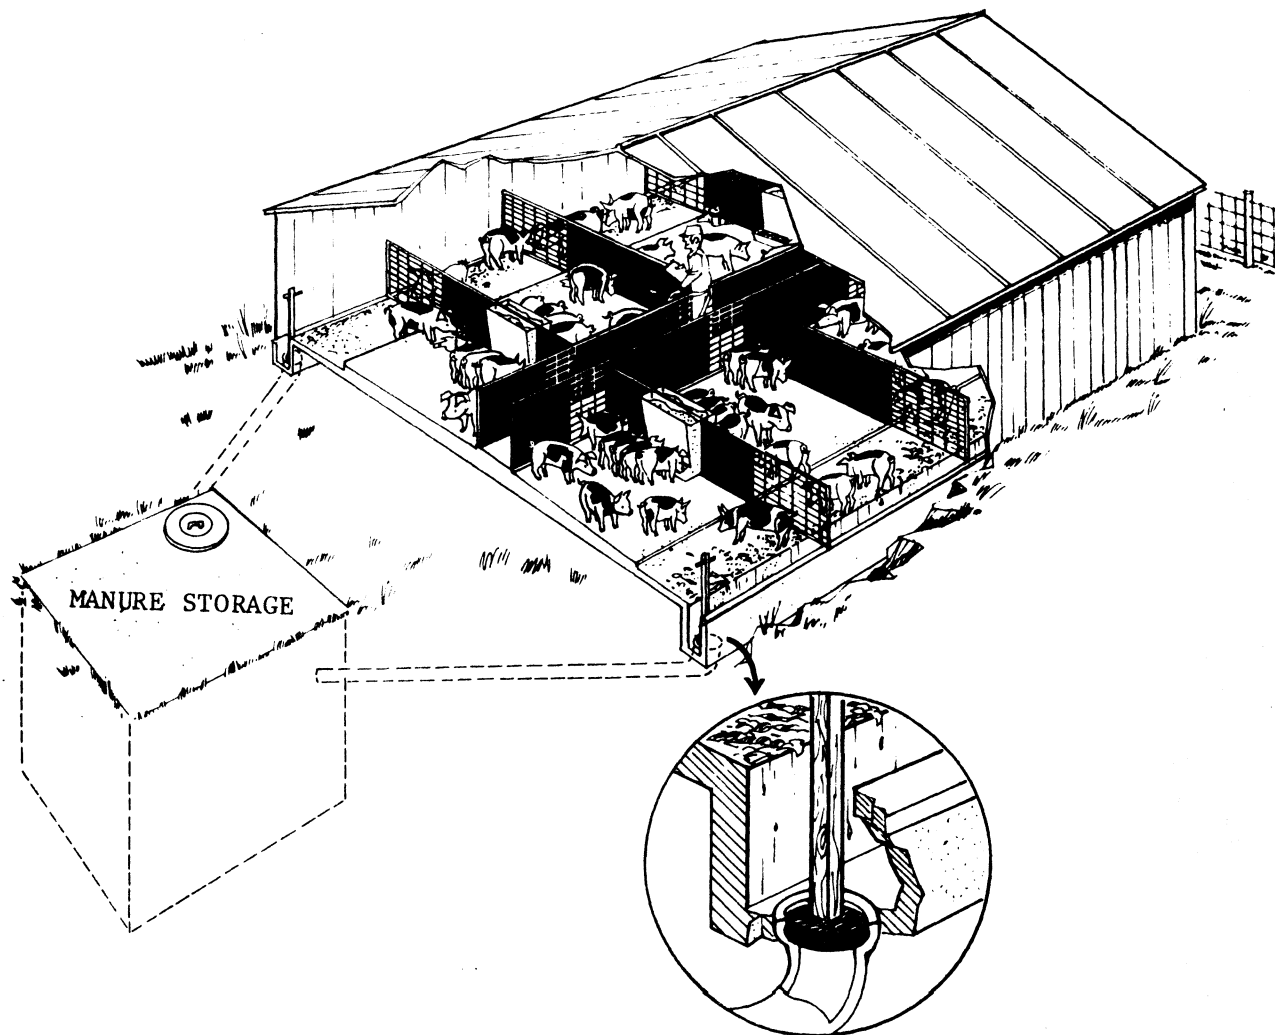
Fed hogs - confined, concrete floor, narrow gutter, outside storage, liquid handling.
